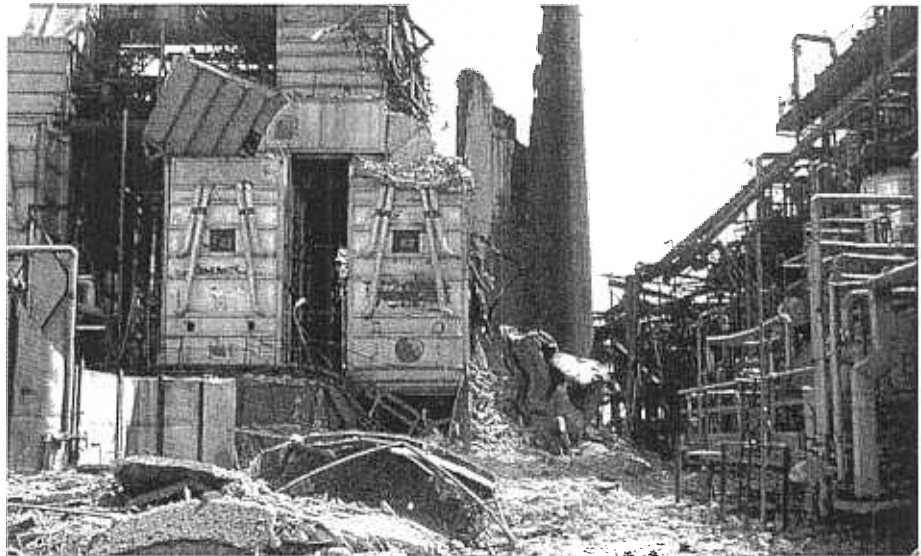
Collapsed 90-meter reinforced concrete stack at the Tüpras refinery caused extensive damage and fires. (Photo: Johnson)
